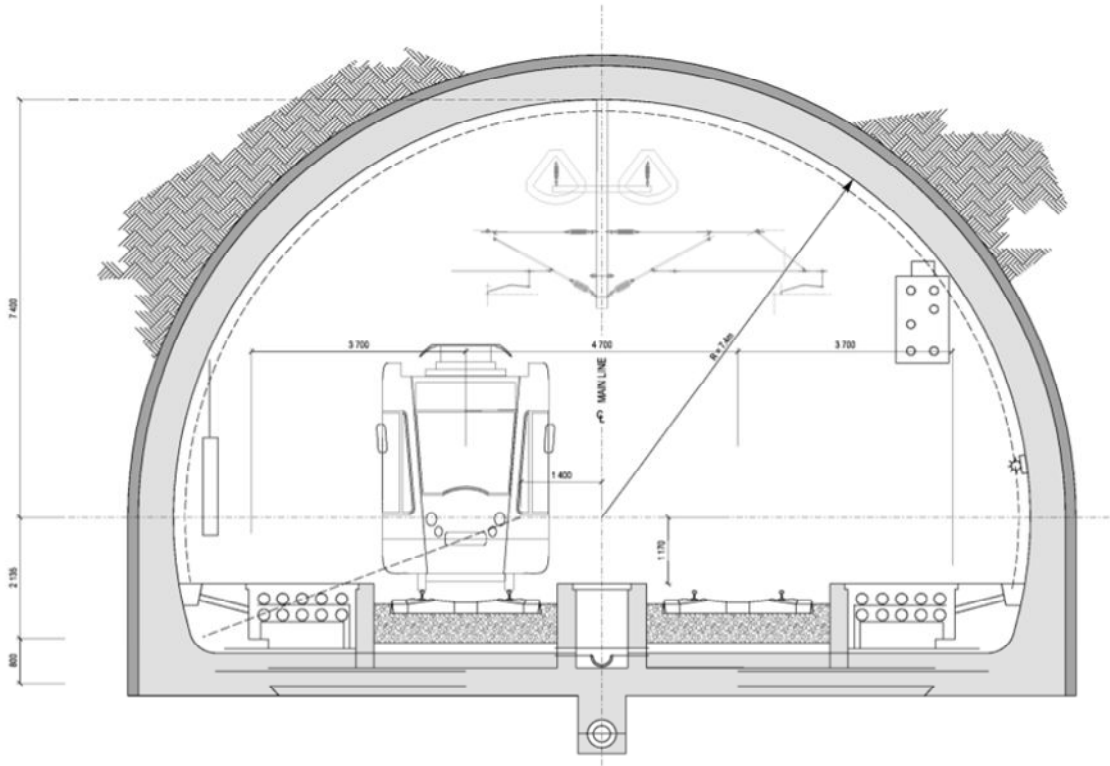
Typical cross-section of a double track electrified tunnel (Aurecon; 2014).
